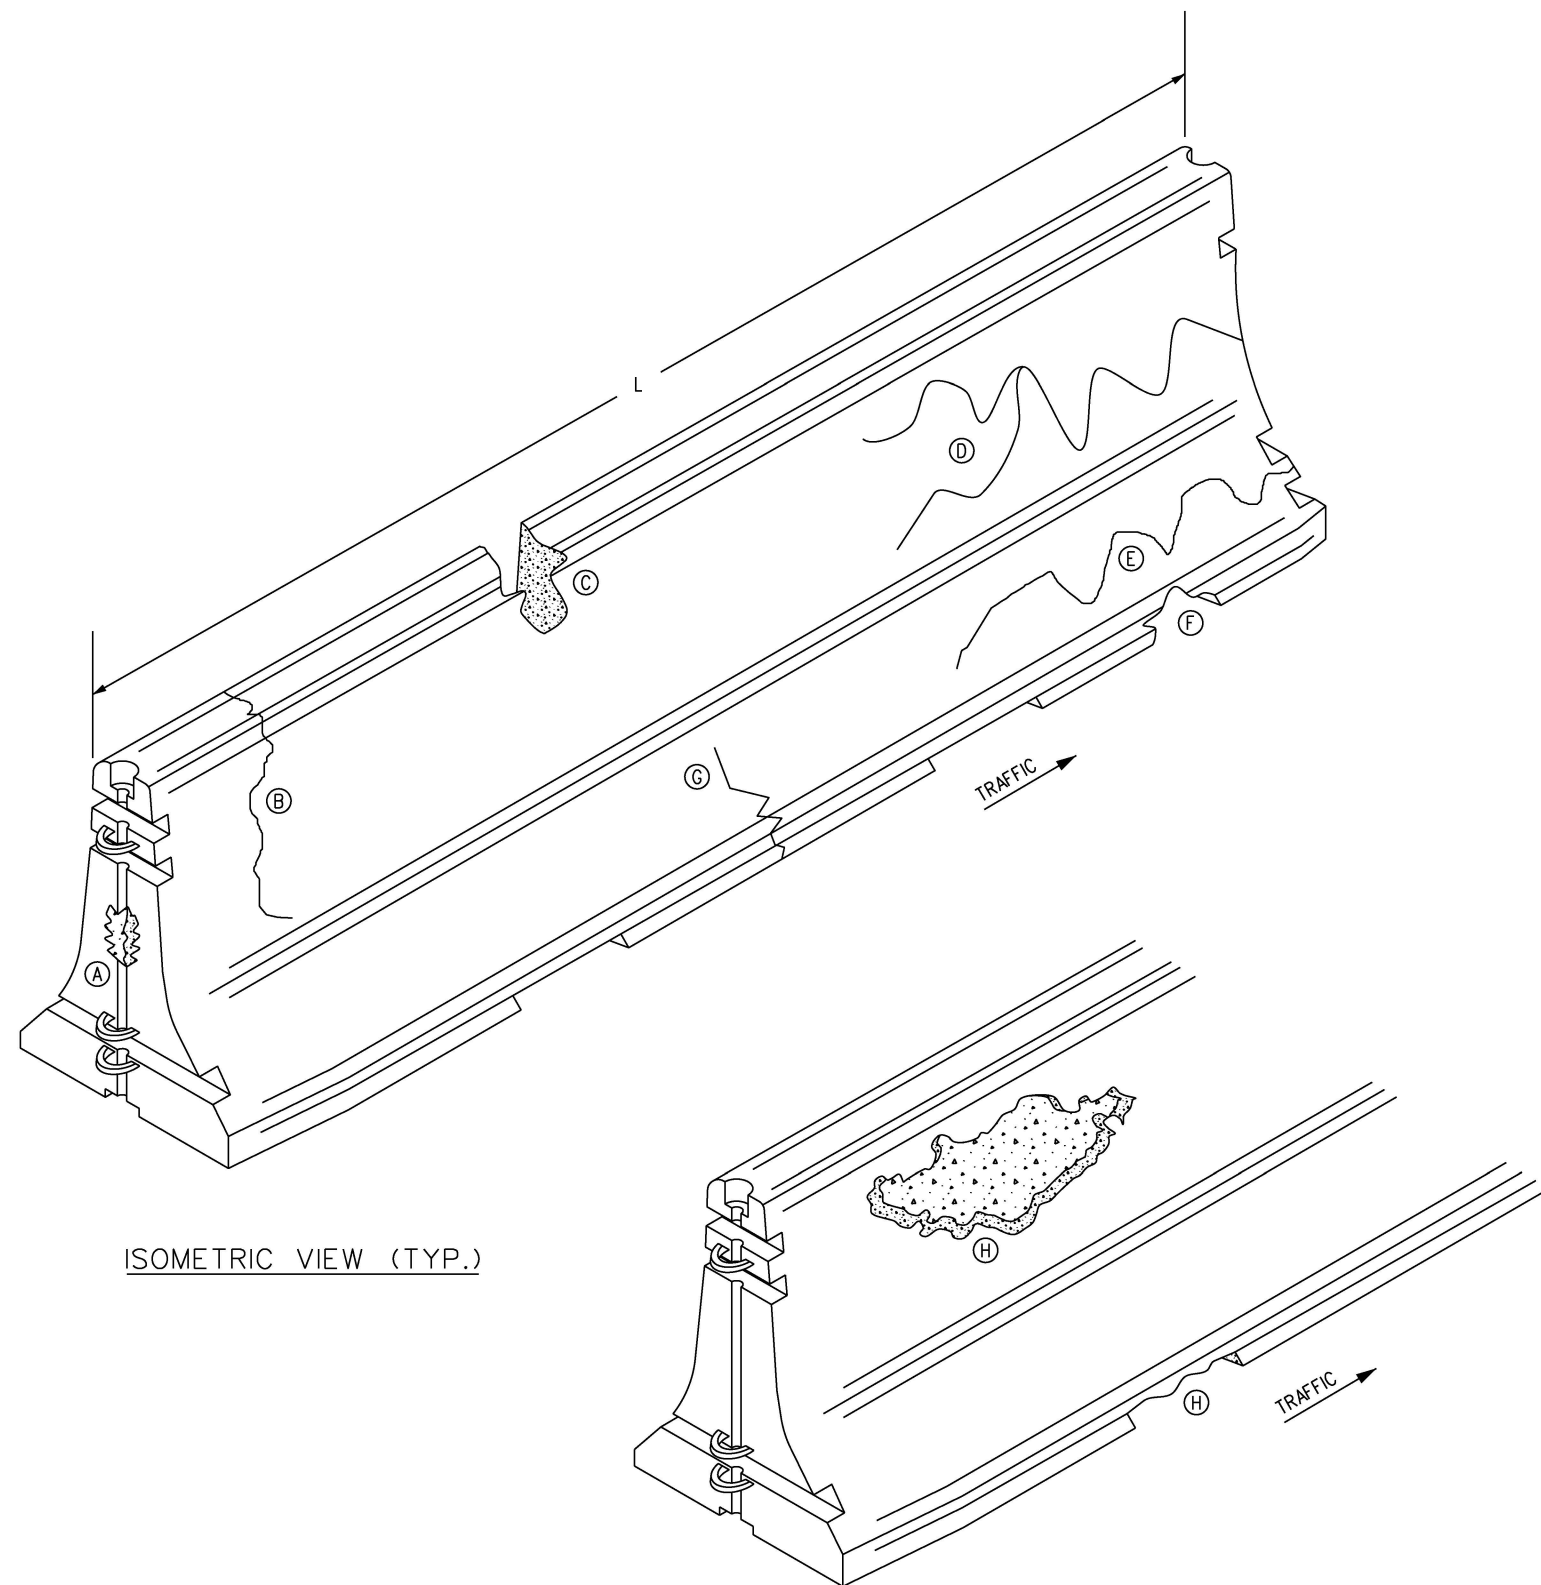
DETAILS FOR STABILIZATION OF PERMANENT OR TEMPORARY PINNED PRECAST TYPE 7 CONCRETE BARRIER
